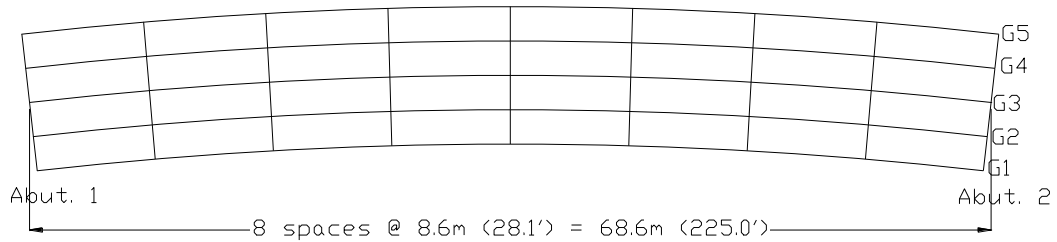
Stage 5 of Construction for Single Girder (Inner Girder Placed First) Erection of Single-Span, 5-Girder, 305-m (1000-ft) Radius Bridge.
